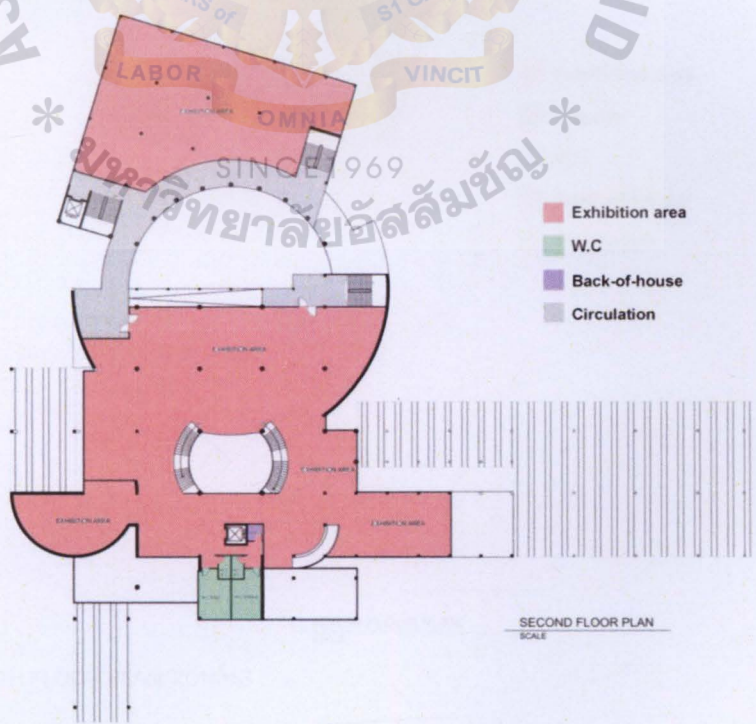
SECOND FLOOR PLAN: ZONING
